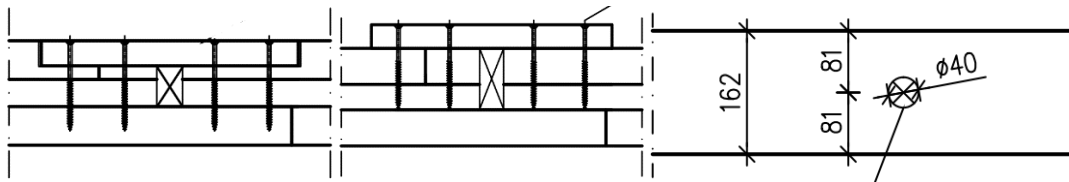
Installation hole options for SAS 670/800 22TR rod to be placed inside the LVL-X wall. Courtesy of A-Insinööri, Joensuu
